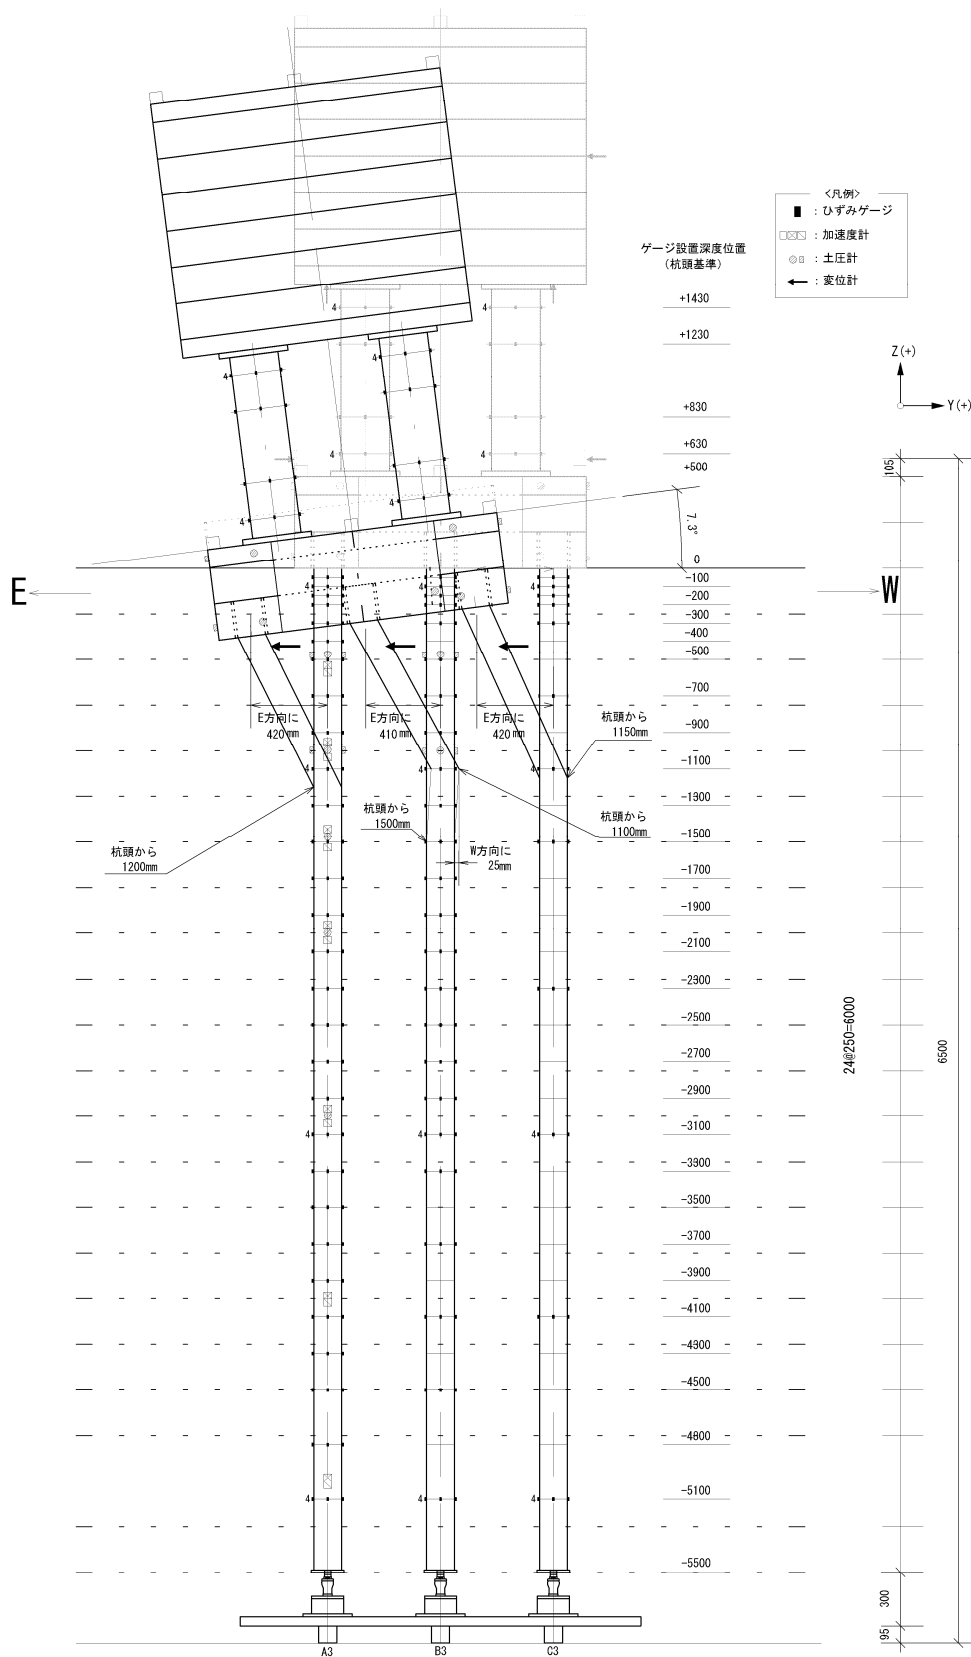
Piles after the test: Piles A3, B3 and C3 in east-west section.
